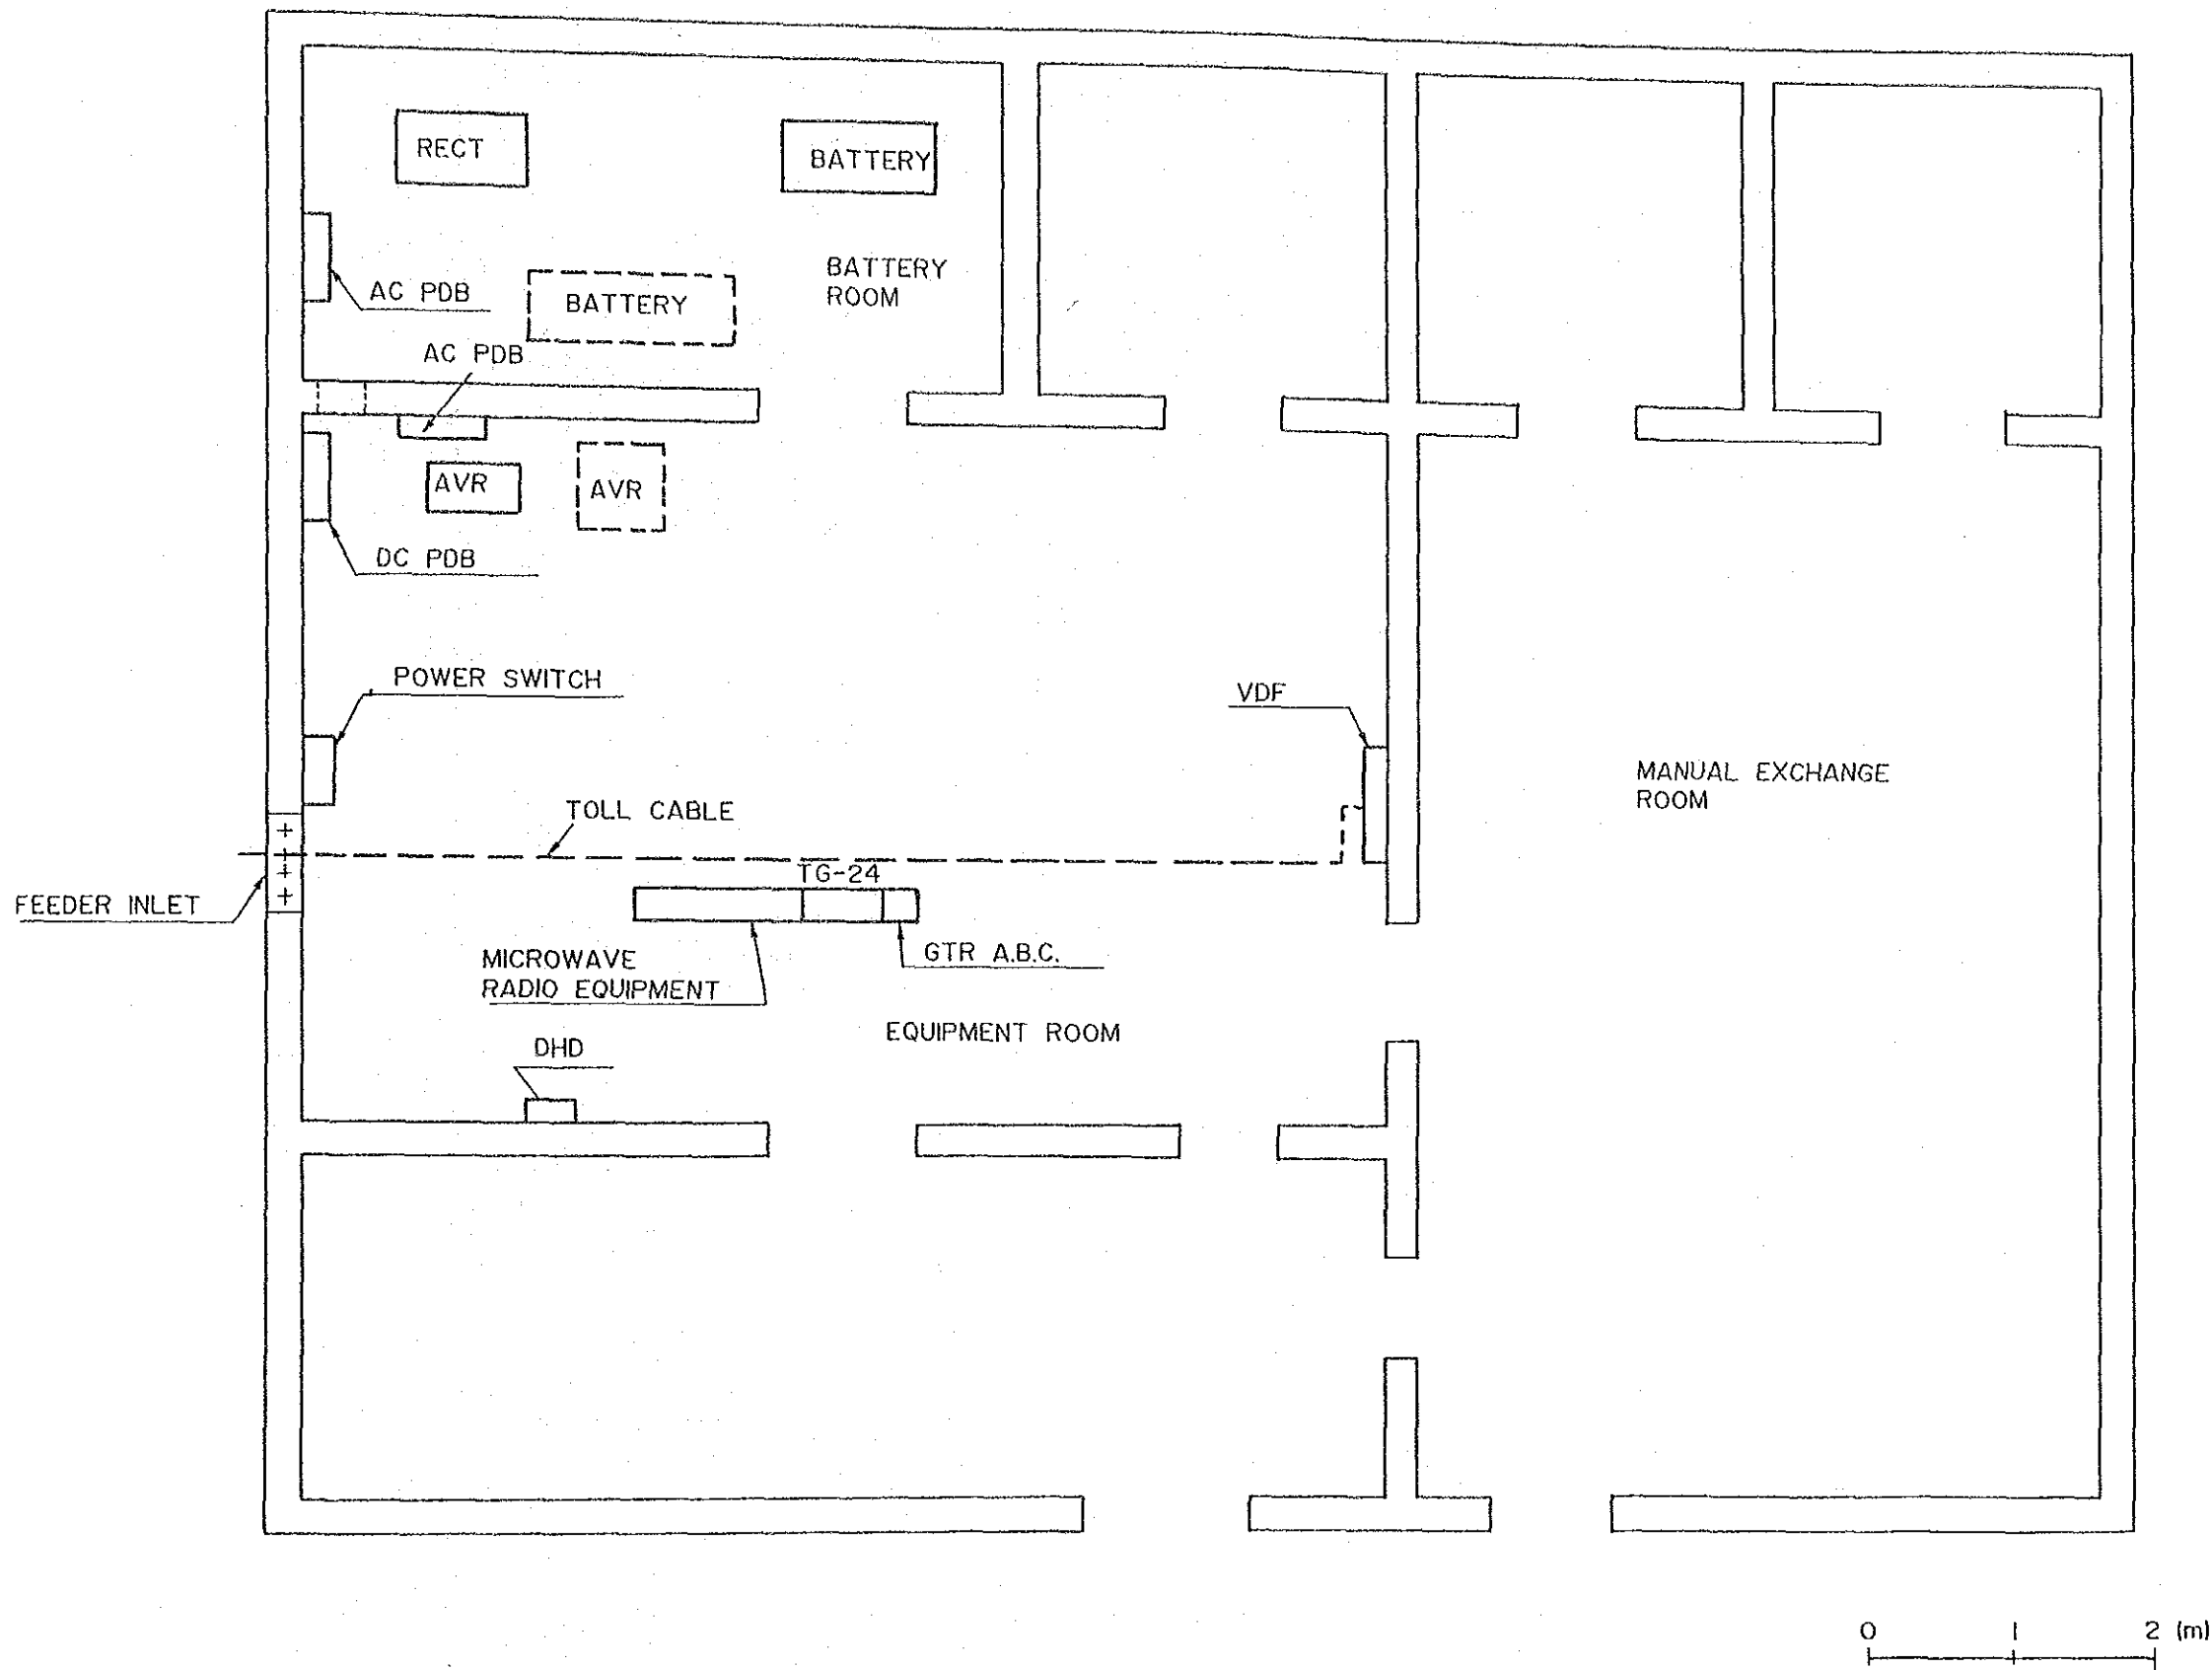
Floor Layout at Myaungmya Microwave Station
